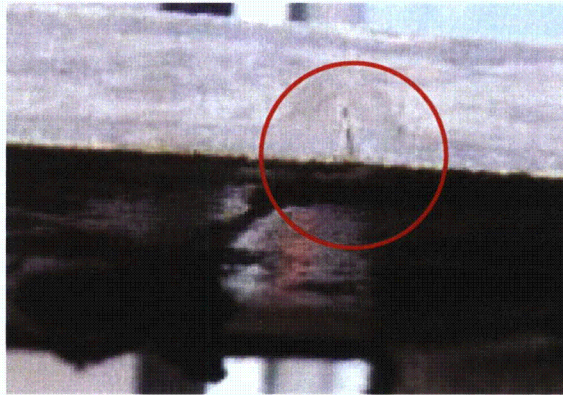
Internally cracked pipe column at "horseshoe" fold of reinforcement material
